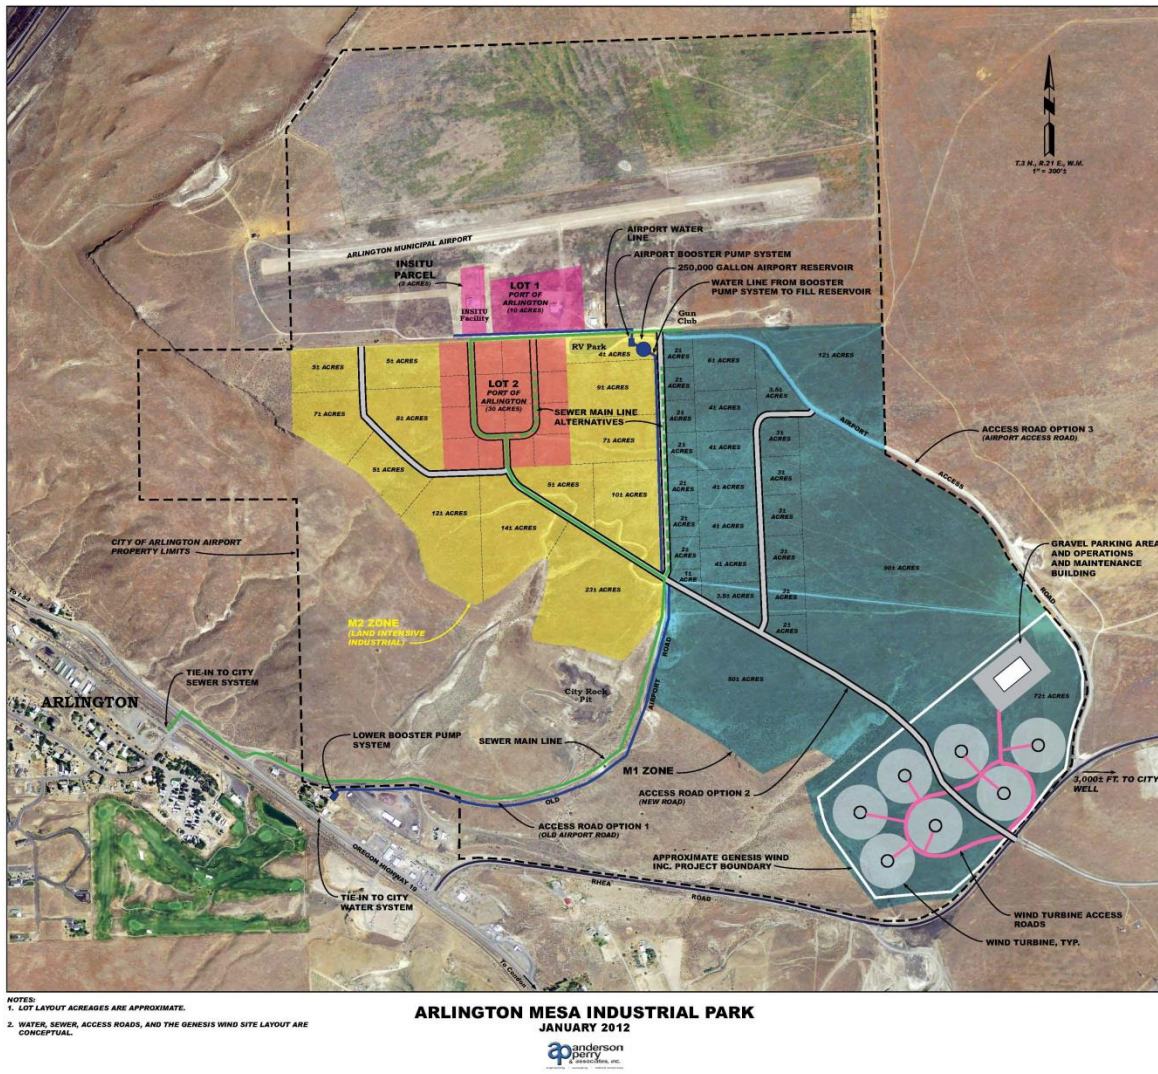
Arlington Mesa Industrial Park Plan
